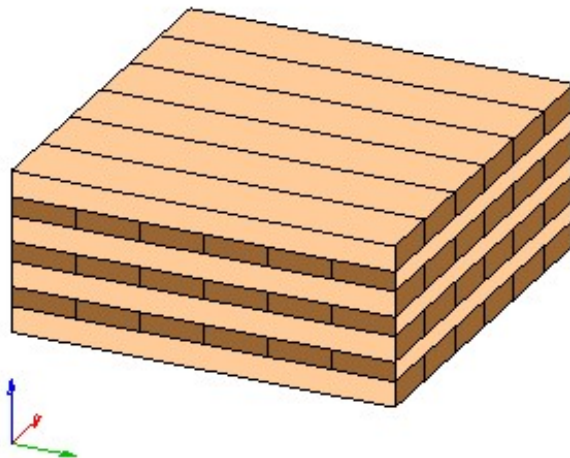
Illustration of Cross laminated timber slab (Strusoft, 2021).
